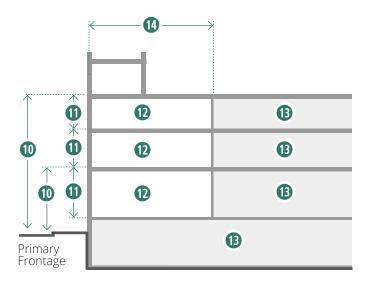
H-2. Civic Building: Height & Use Requirements
